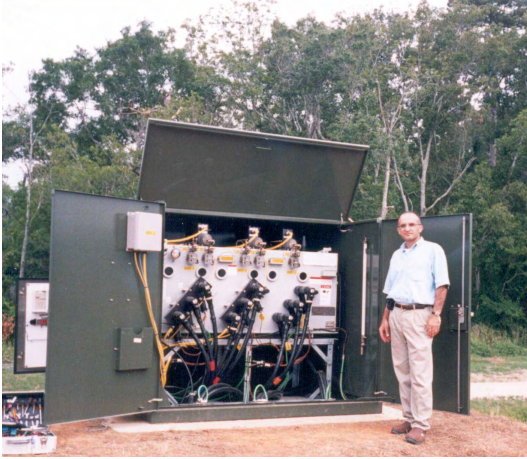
Shown above is the Canada Power Products switchgear installed at the northshore of the Lake Pontchartrain Causeway. Each shore installation is equipped with SF6 Puffer Loadbreak Switch with RFI for fault isolation and sectionalizing between the utilities and the bridge.
